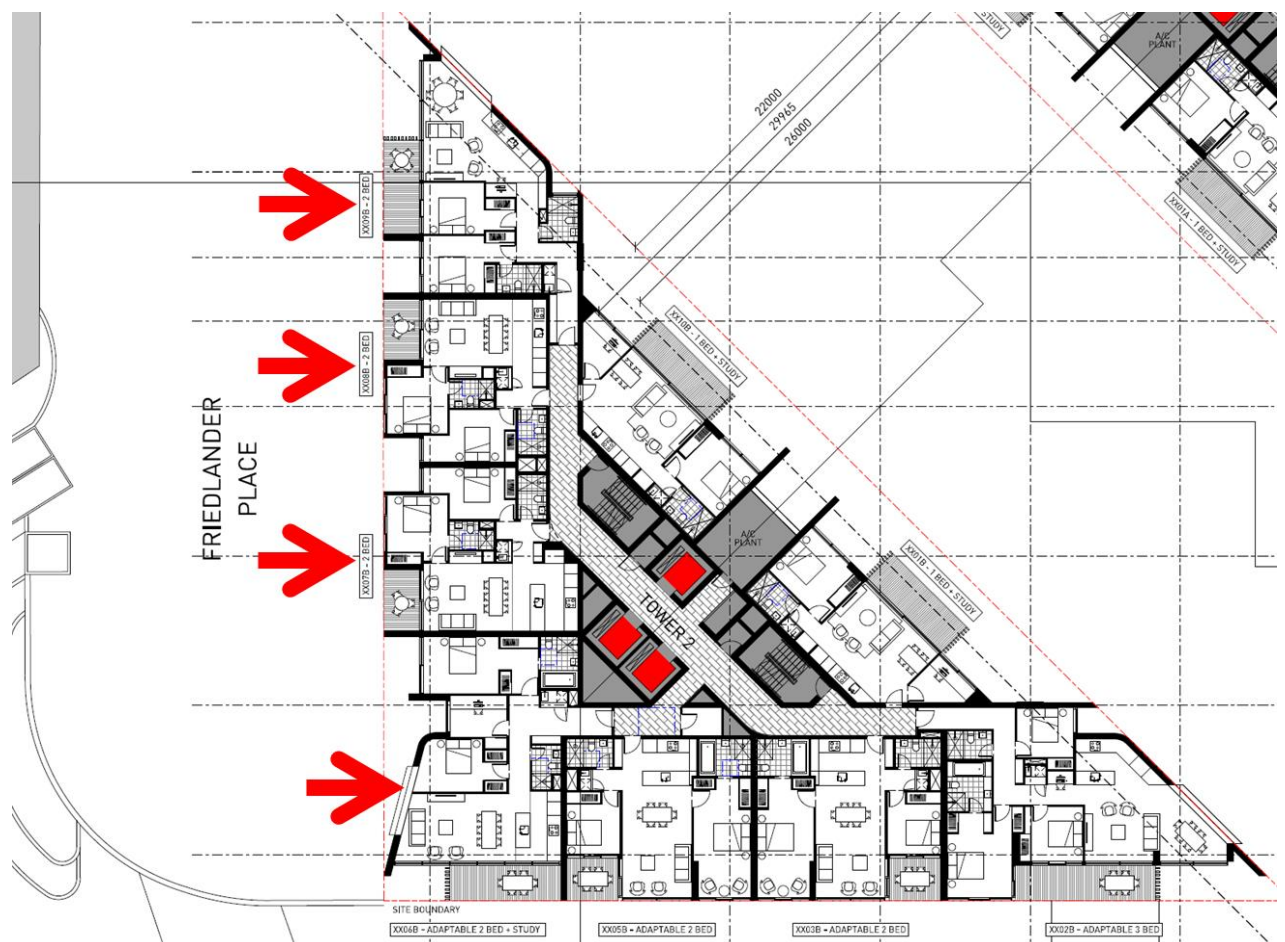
is a partial plan of a typical floor of that building, identifying the key units:
